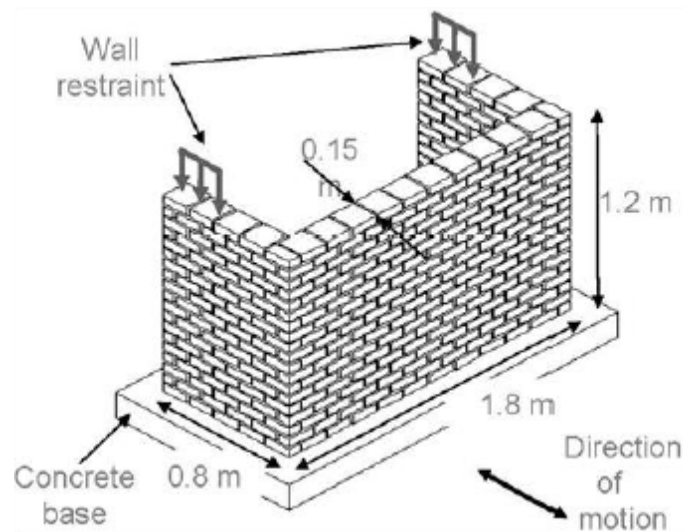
Specimen configuration and dimensions of u-shaped wall unit (Dowling 2006).
